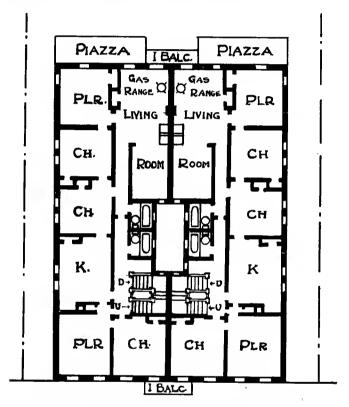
PLAN OF 16-FAMILY TENEMENT HOUSE ON LUBEC STREET IN EAST BOSTON. Scale 20 feet to 1 inch.
